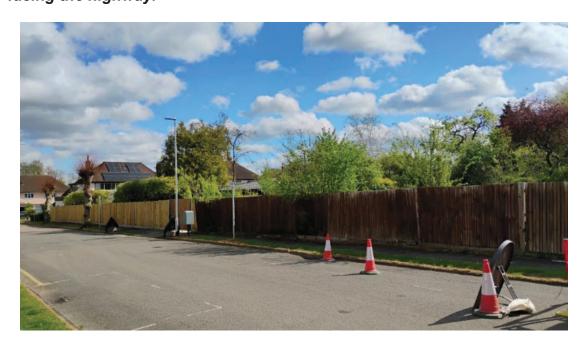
Google street view showing Application Site on the right and 1A and 1 Grove Road on the left.
